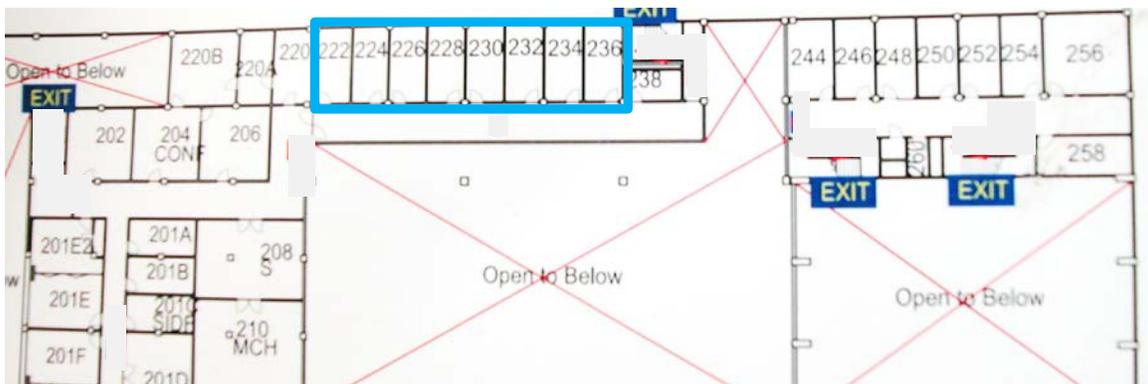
Halligan Hall Second Floor Study Area – Study Area (Blue Box)
